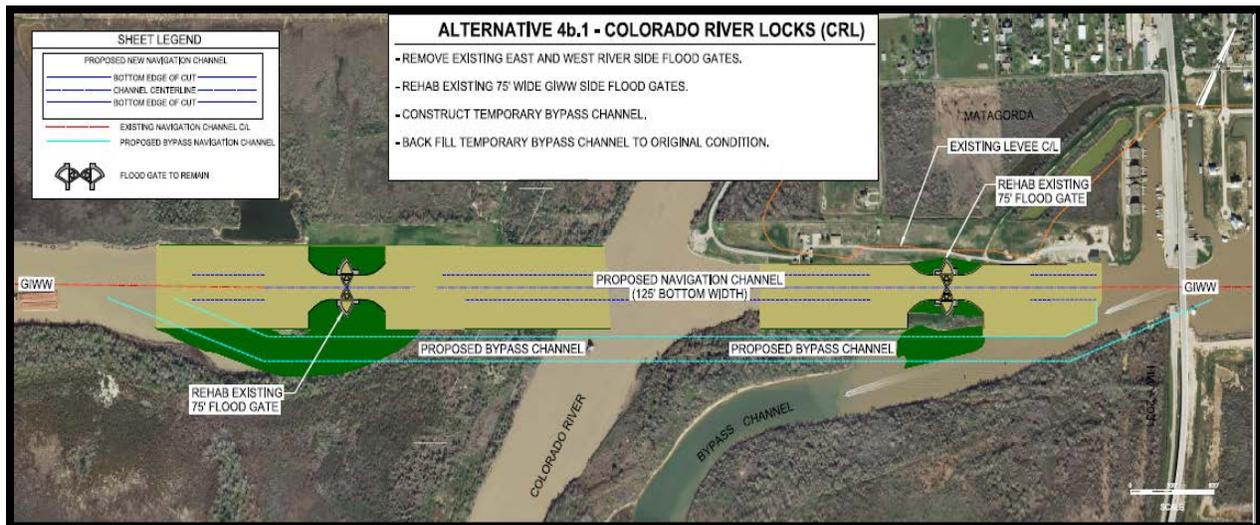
Recommended CRL Plan – Alternative 4b.1
